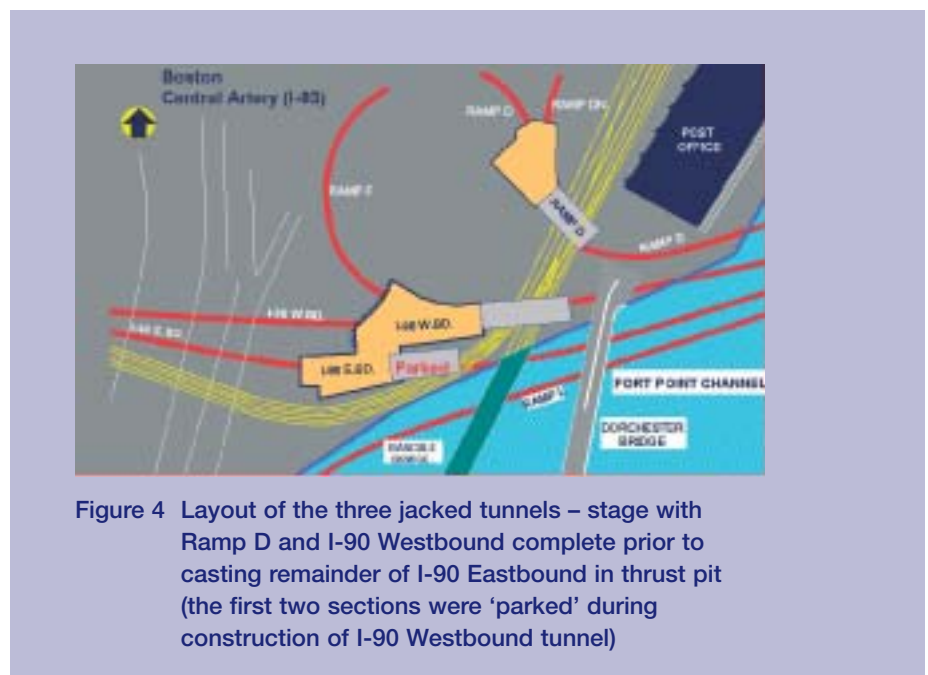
Layout of the three jacked tunnels – stage with Ramp D and I-90 Westbound complete prior to casting remainder of I-90 Eastbound in thrust pit (the first two sections were ‘parked’ during construction of I-90 Westbound tunnel)
